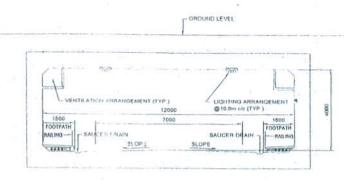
Typical Cross Section for Normal Portion (Type-3)
